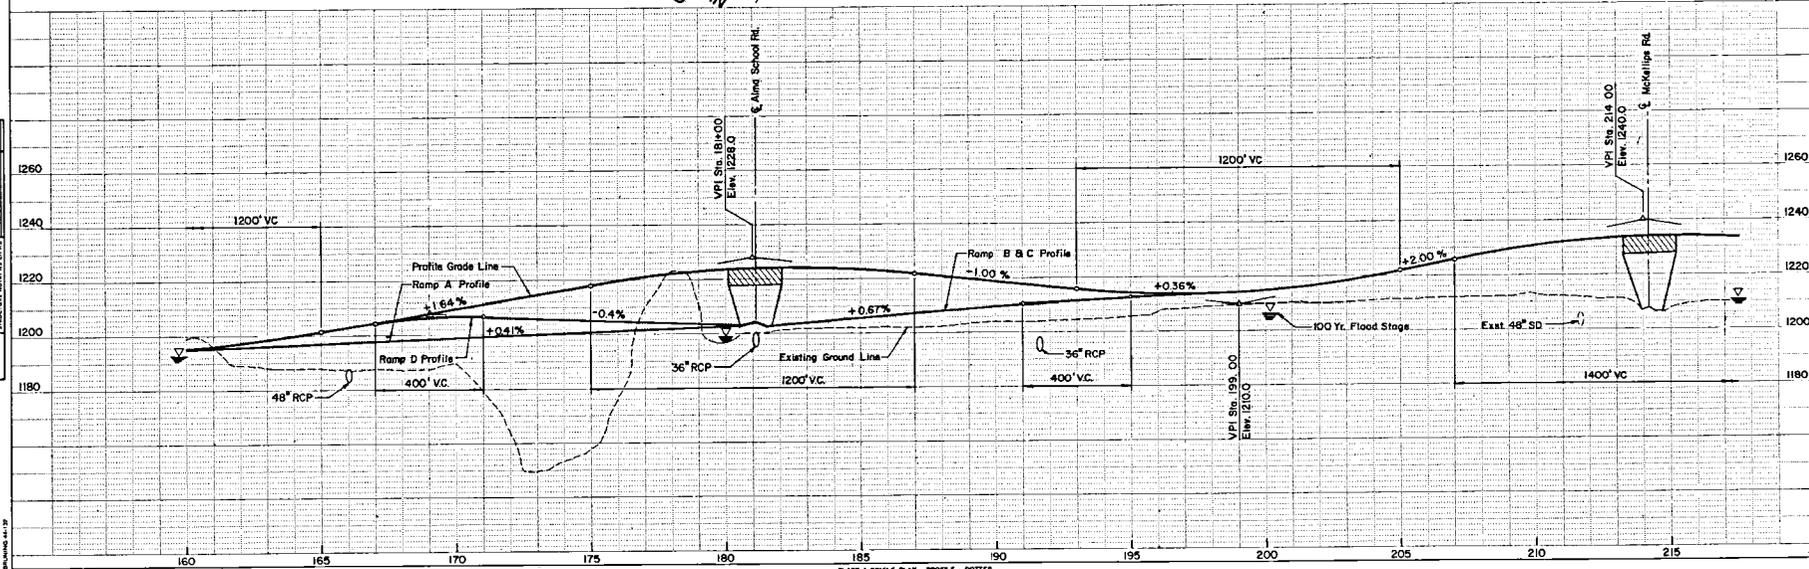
SINGLE PLAN - PROFILE - DOTTED
